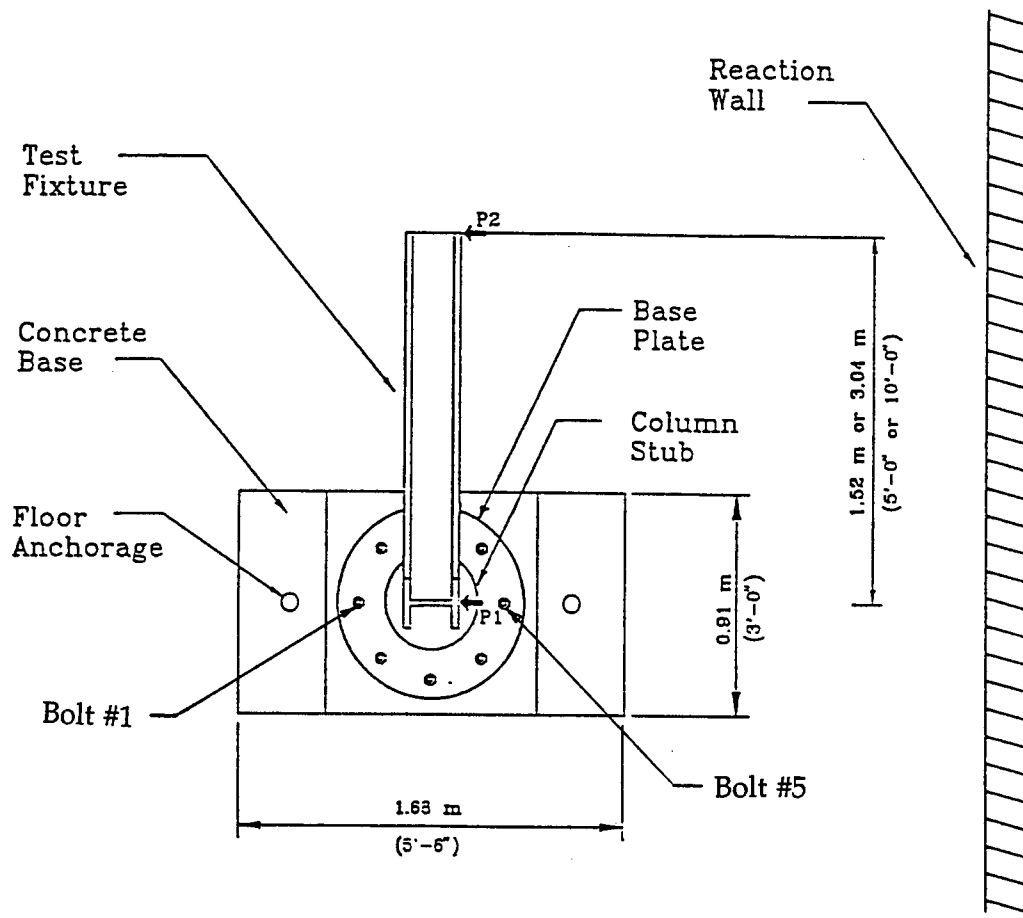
(b) - Anchor Bolt Group Test Setup (Plan)
